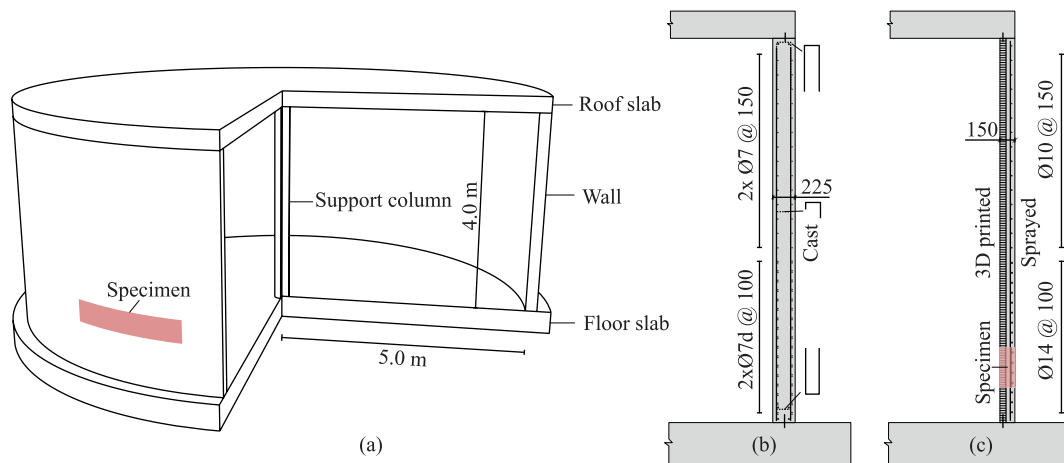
Circular concrete water tank: (a) three-quarters of a wall tank structure; (b) reinforcement layout of a conventional water tank wall; (c) reinforcement layout of a 3D concrete printed and sprayed water tank wall (dimensions in [mm]).
